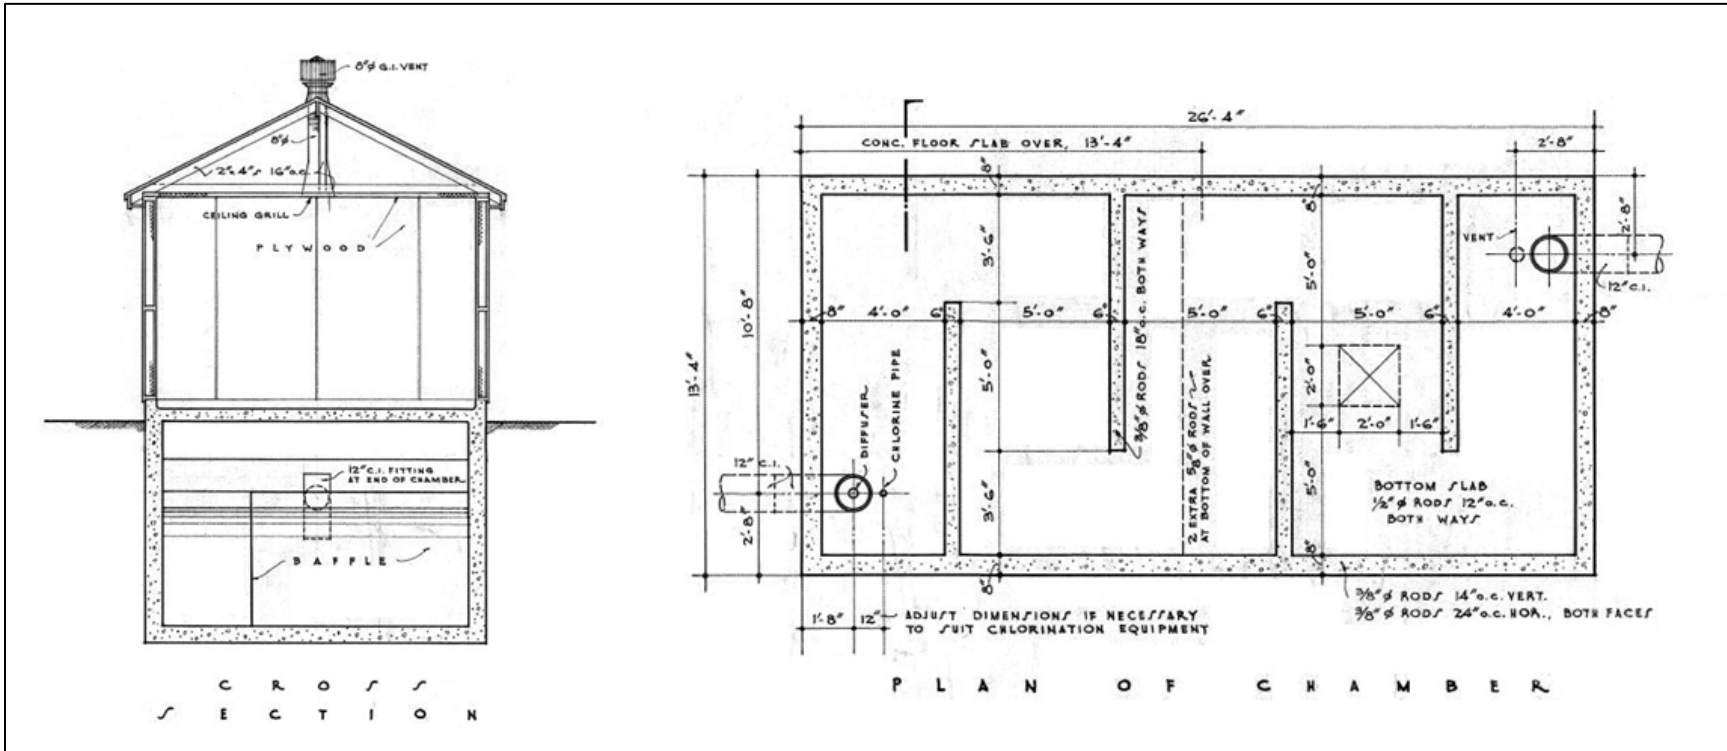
1941 Construction drawing - Chlorination chamber cross section 2 and plan view (measurements in feet and inches) (Modified from DND Engineer Services Branch 1941b)
